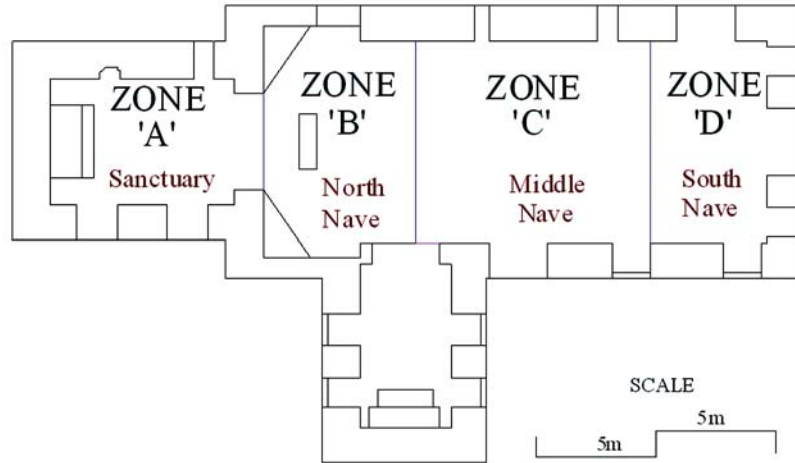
Ground Floor plan with the zones demarcation (Floor plan courtesy: Engr.Thomas D'Costa)
